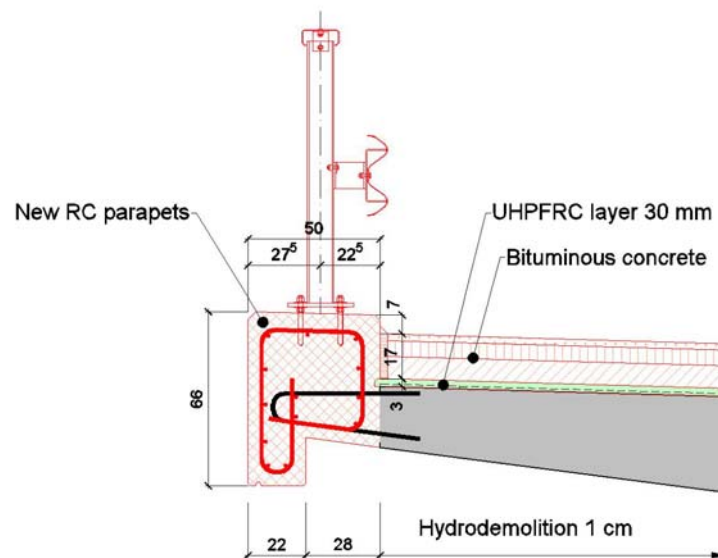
Detail of the new parapets and the UHPFRC layer over the concrete deck
